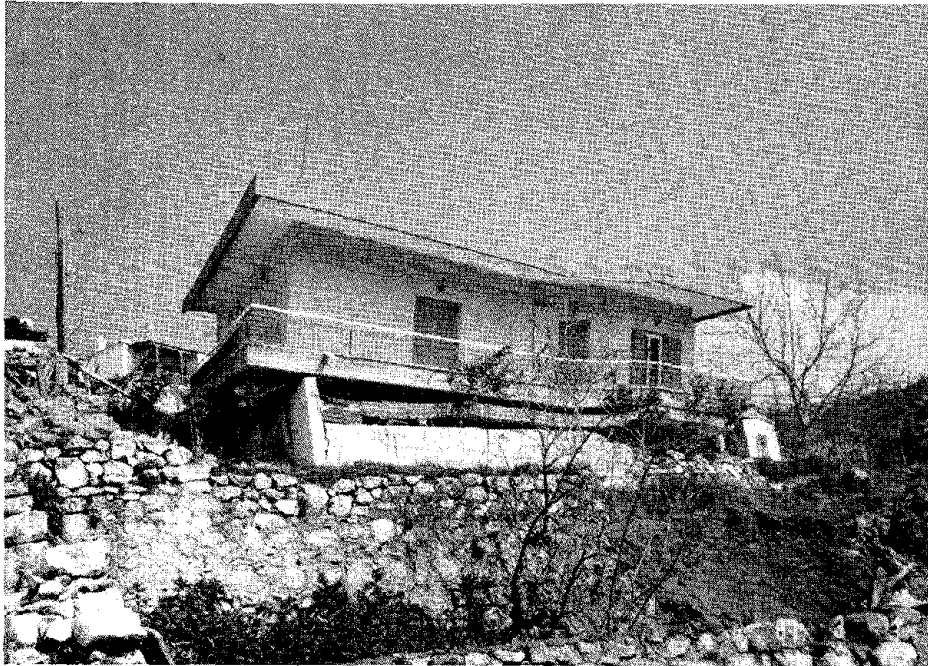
Damage to a three-story house built on sloping ground in Perahora. The retaining wall at the back of the house, which acts as a footing, functioned as the axis of rotation.
